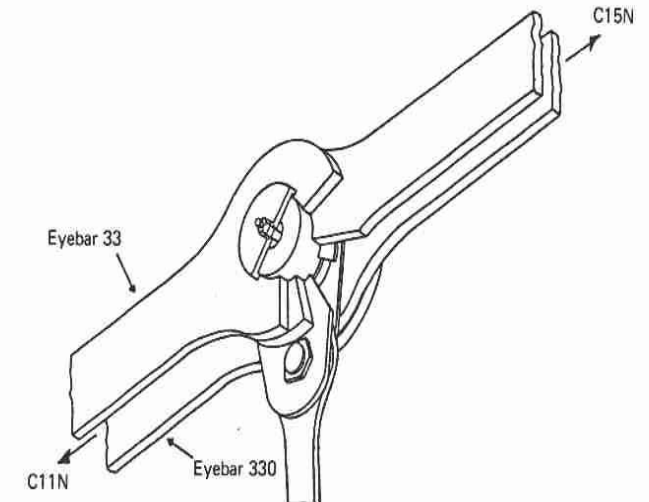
Eyebar chain joint at C13 where the chain was connected to truss by hanger and hanger strap plates.
